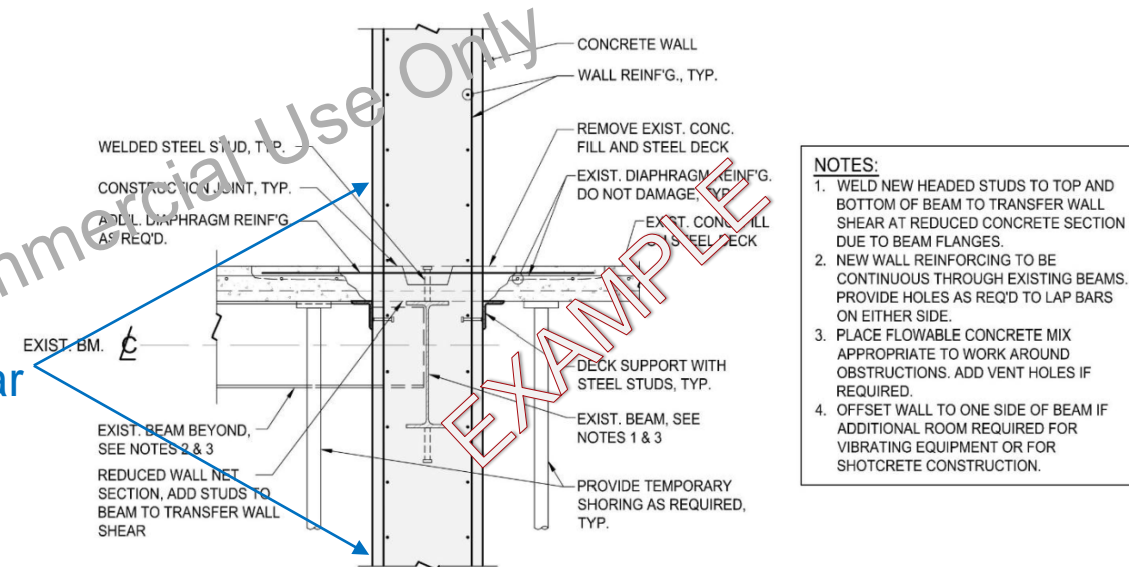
Connection of new concrete shear wall at existing steel beam
